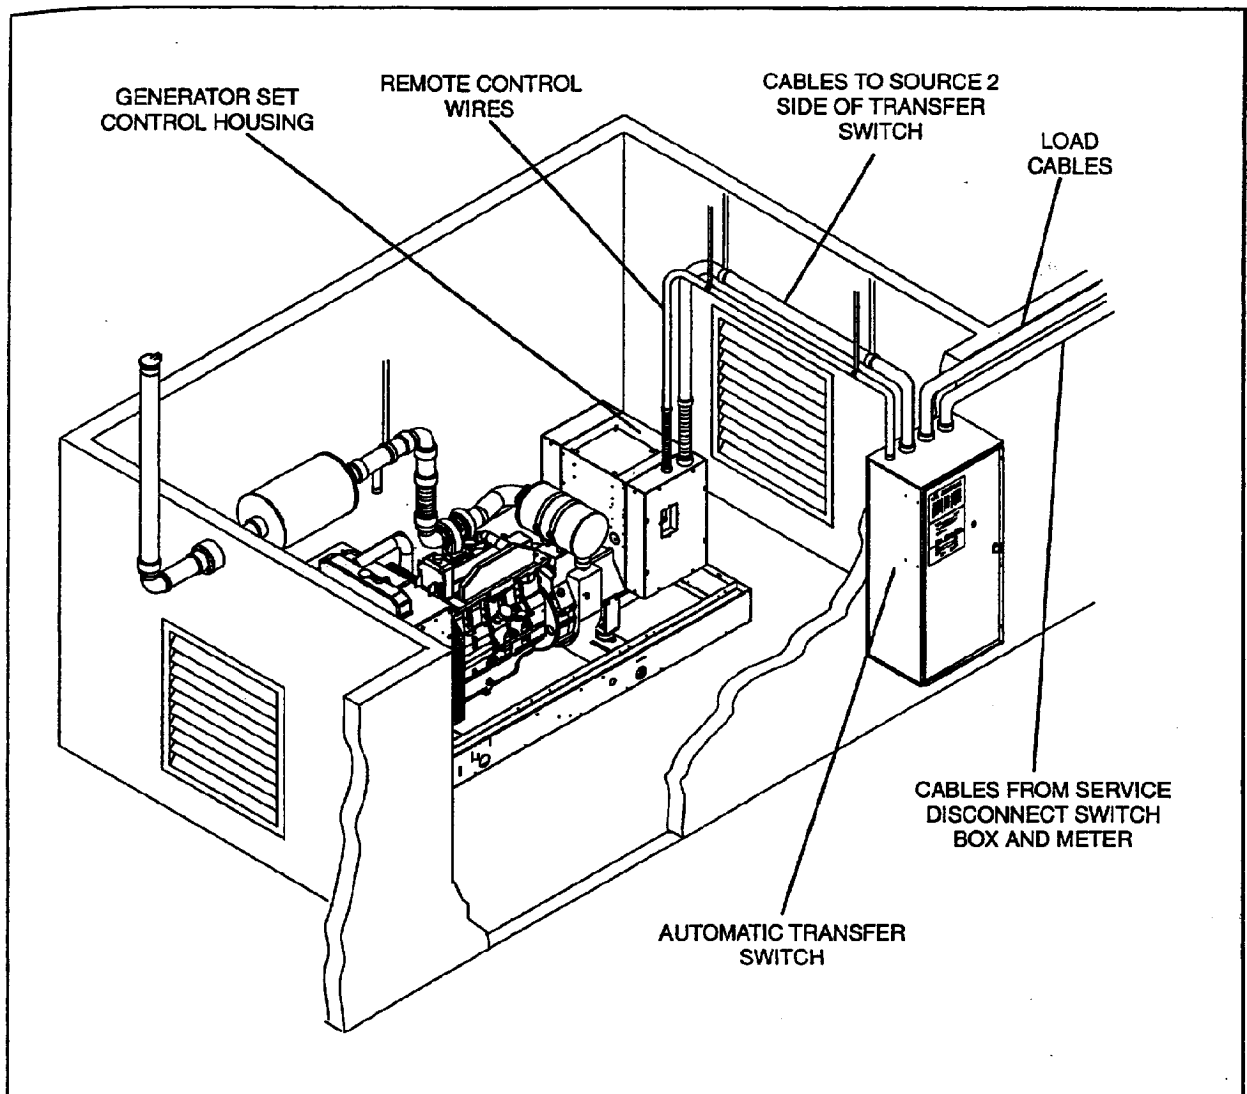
TYPICAL WALL-MOUNT INSTALLATION
